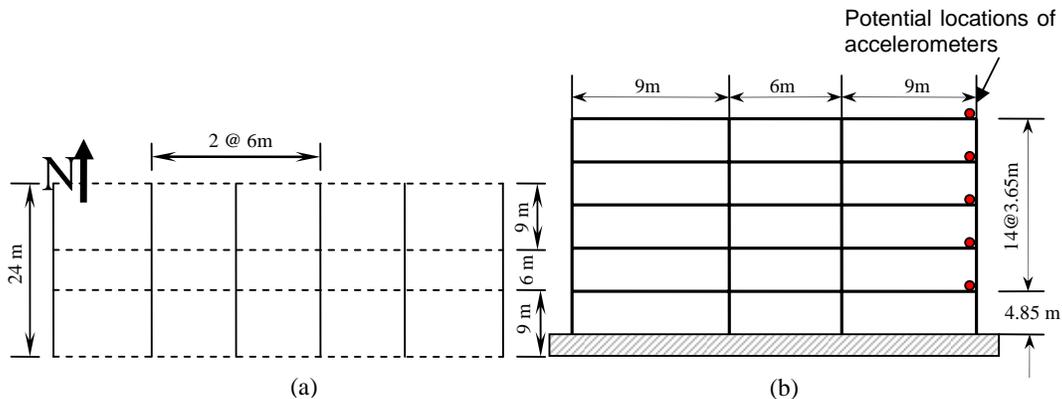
Geometric details of the buildings (a) Typical plan, and (b) Typical elevation (five story).
